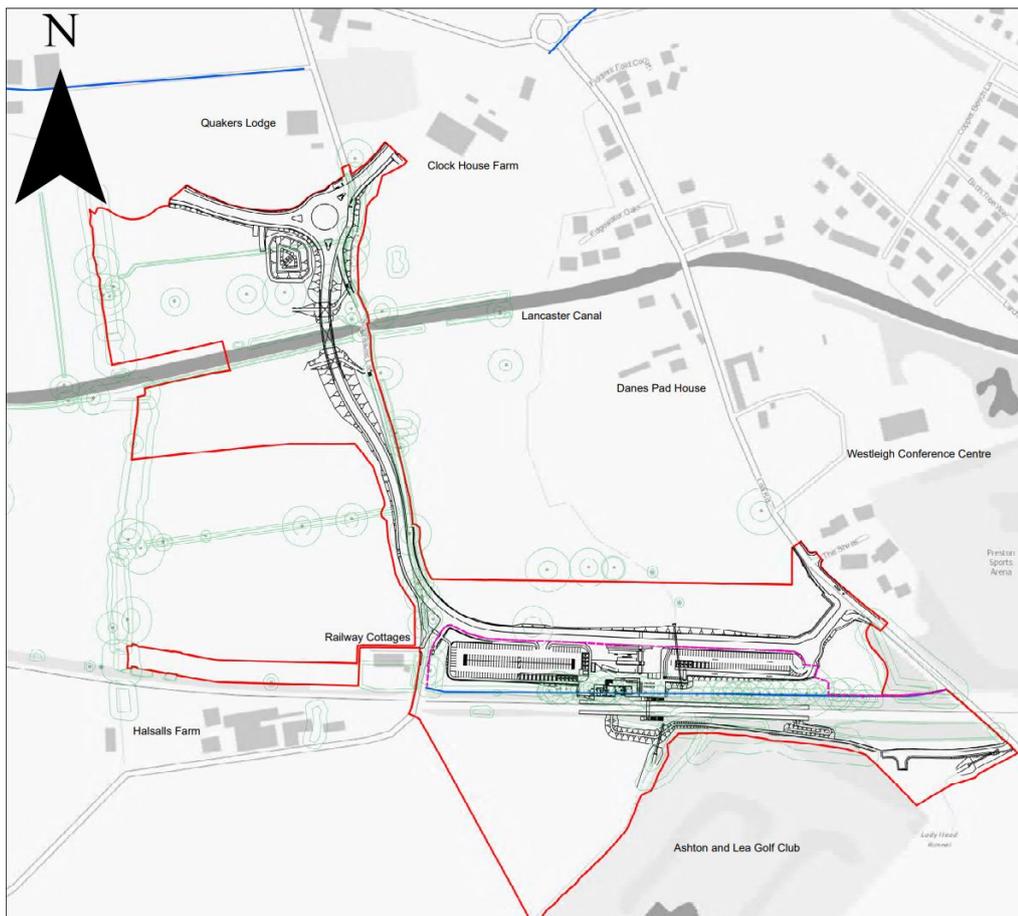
Site Plan for the proposed Cottam Parkway Railway Station
